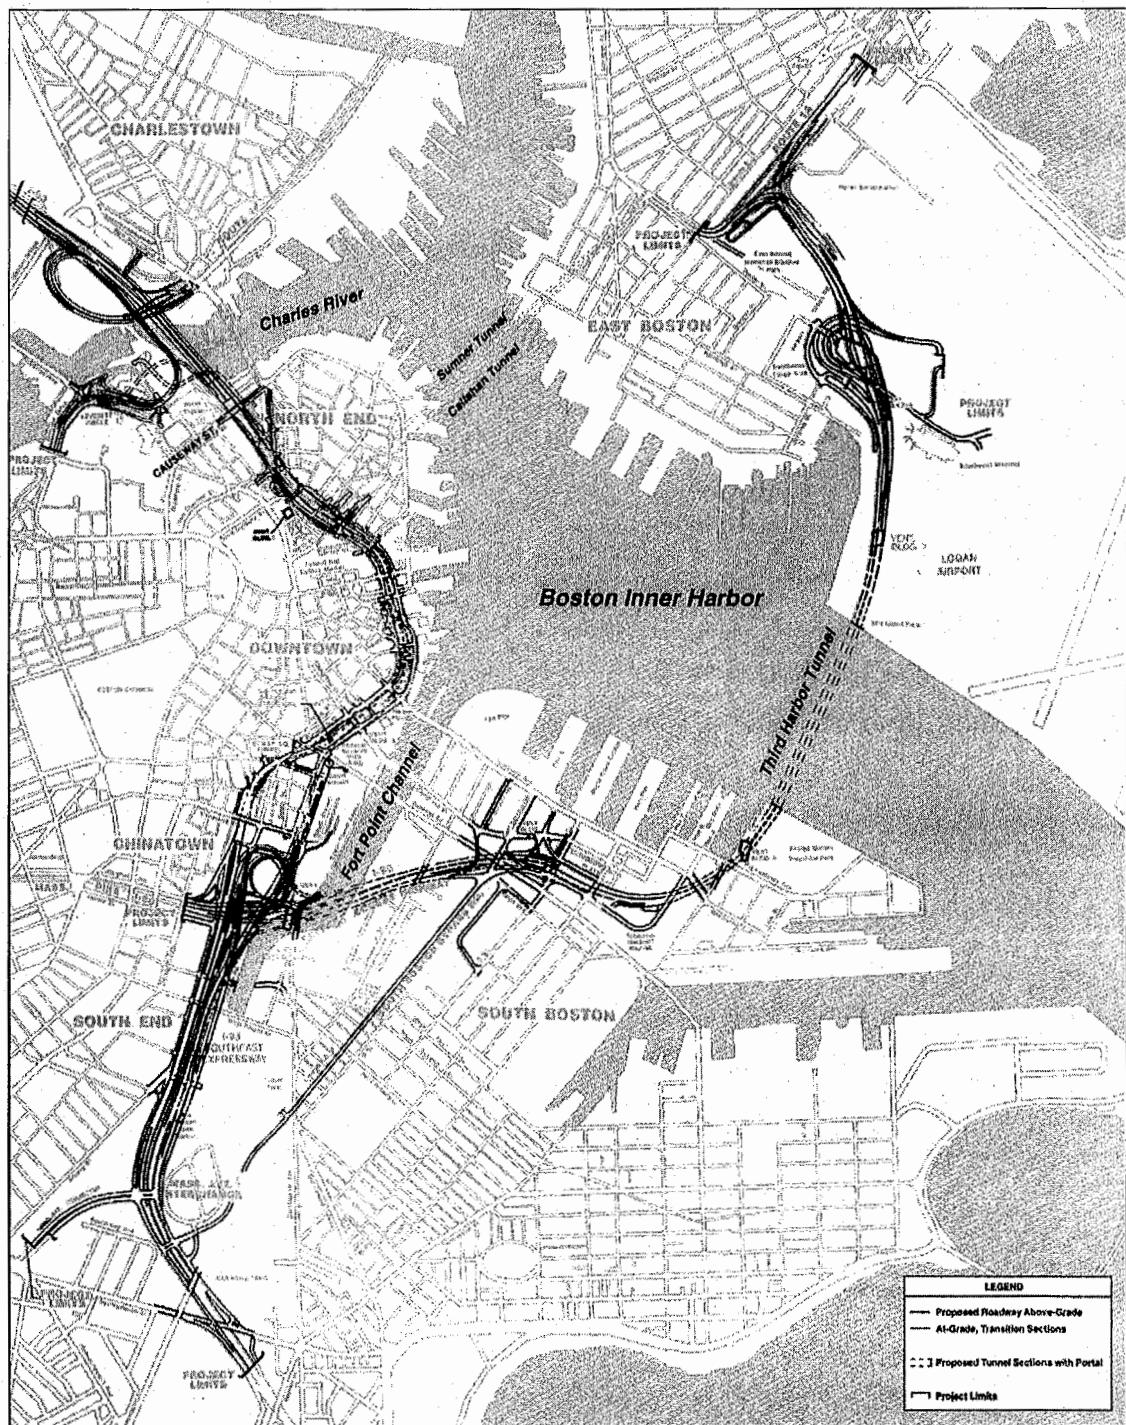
Plan of the Central Artery/Tunnel Project.
